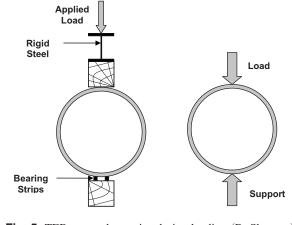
TEB test and associated pipe loading (B. Skourup)
